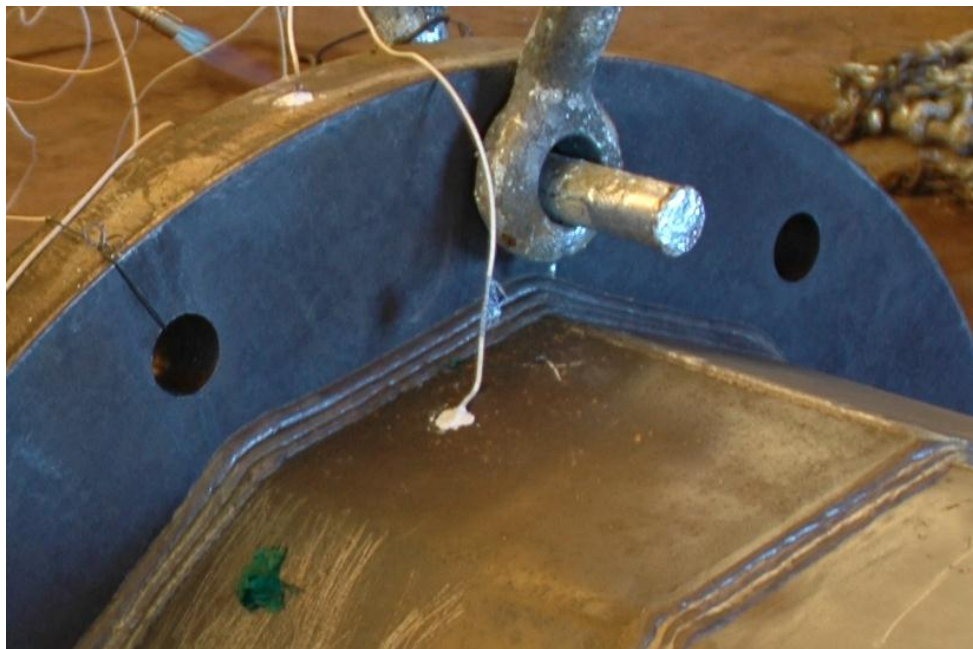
Adhesive thermocouple connection at HMIP external collar location
